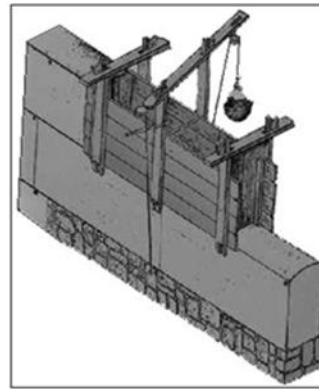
Lift Tapia over the wall with a rope and a reel,
